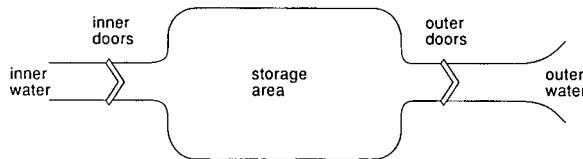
Plan view of a storage reservoir, which is also used to flush the outer channel
